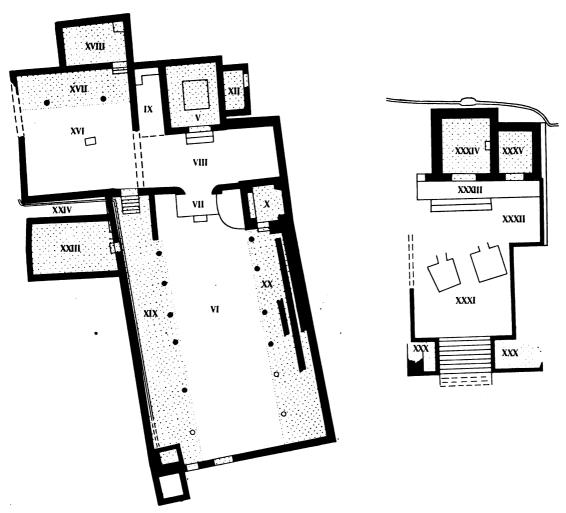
Soli. Altered plan of Temples B and C (Period 4?)
